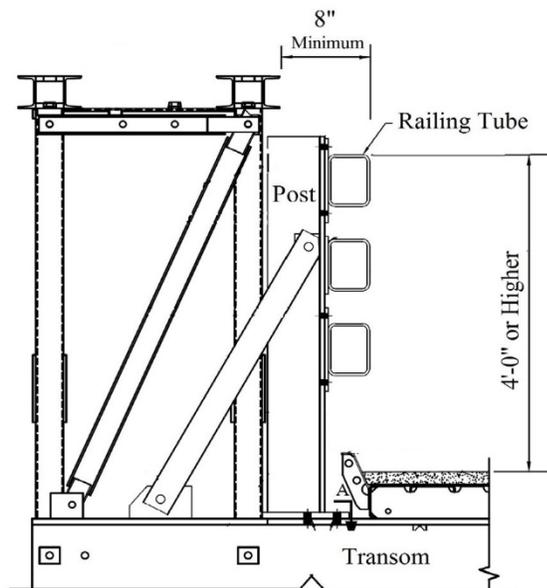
Vehicular Railing Offset Requirement for Railing Height of 4 feet
